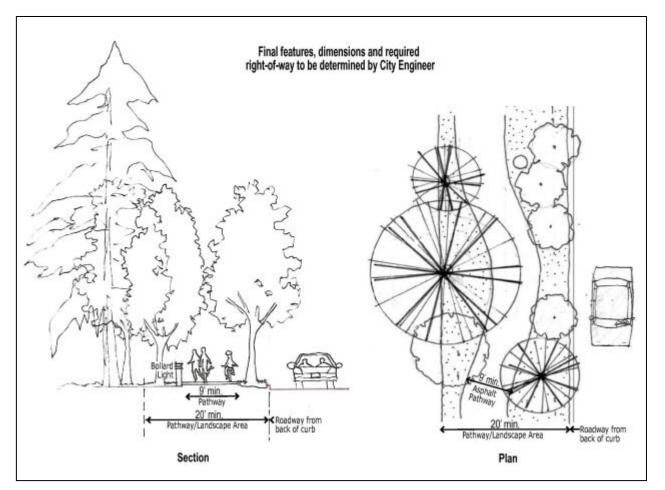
HH: Crossroads Gateway Streetscape
